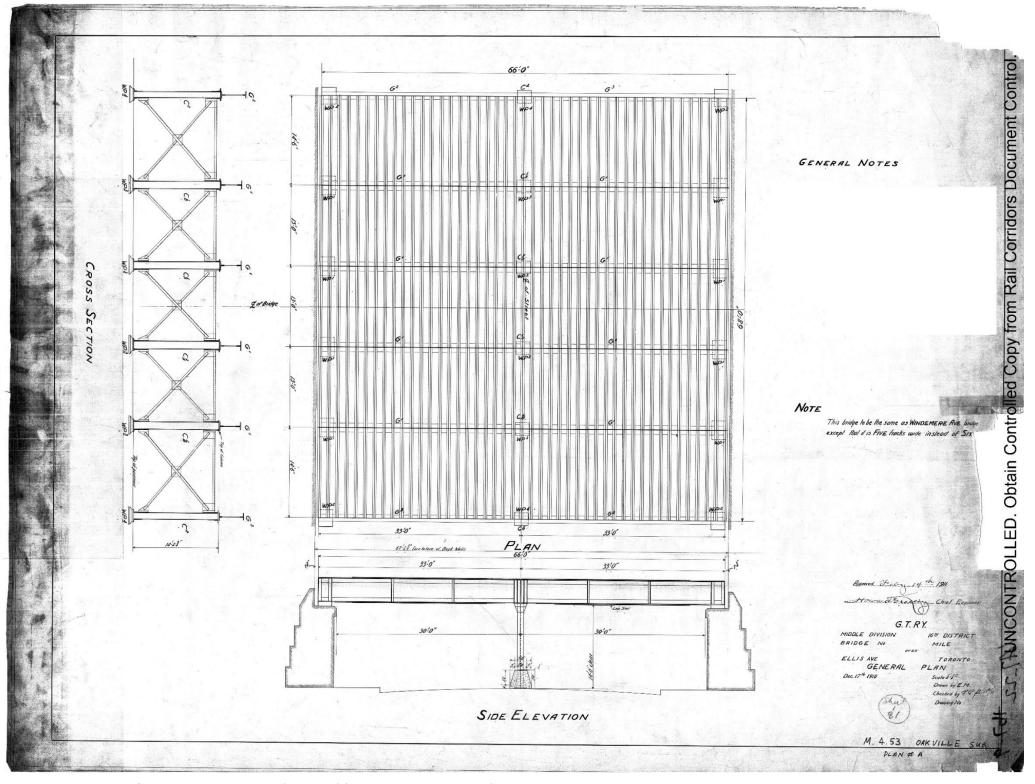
General plan for the Ellis Avenue Bridge (Mile 4.54) (Grand Trunk Railway 1910)
